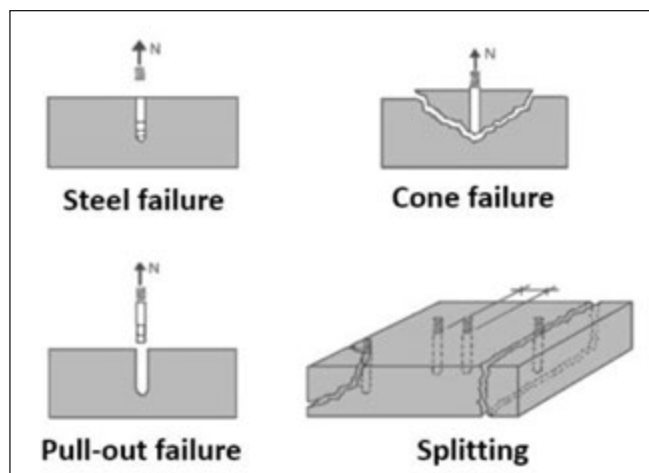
Failure modes (Eligehausen, Hofacker, Lettow 2001)
